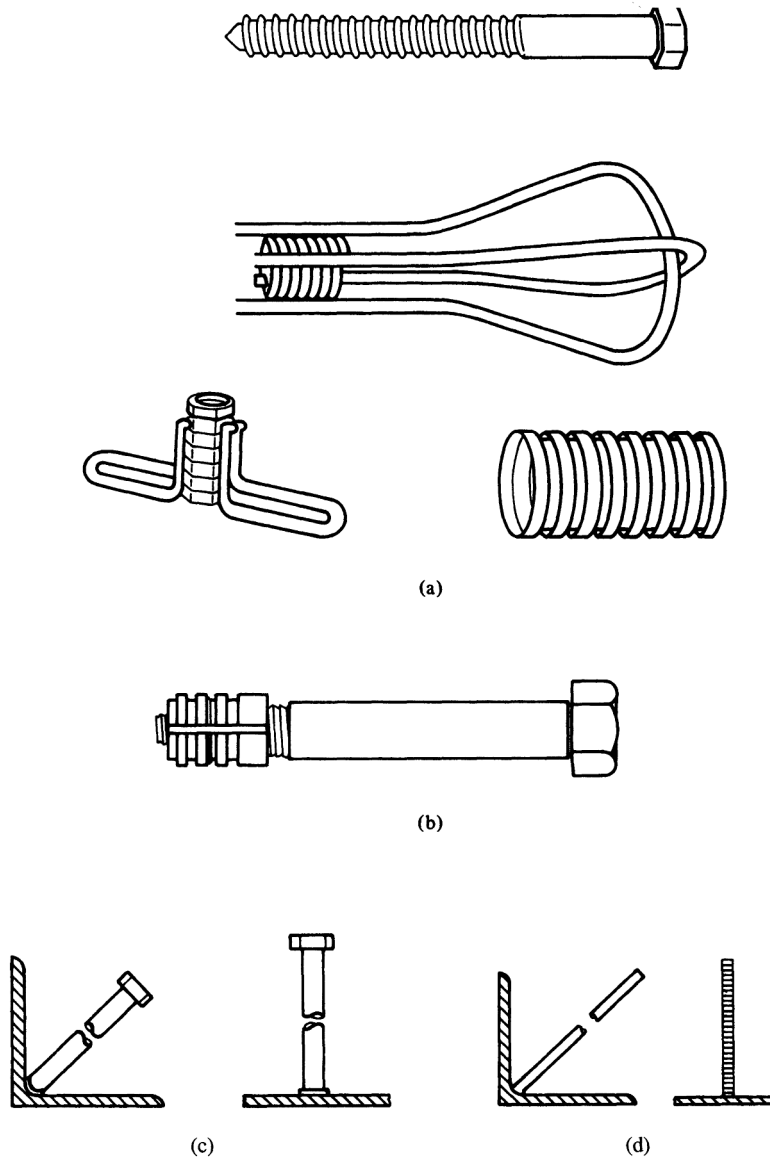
Connection inserts and fasteners: (a) bolt and receptacles; (b) expansion bolt; (c) headed struts; (d) welding to bars
